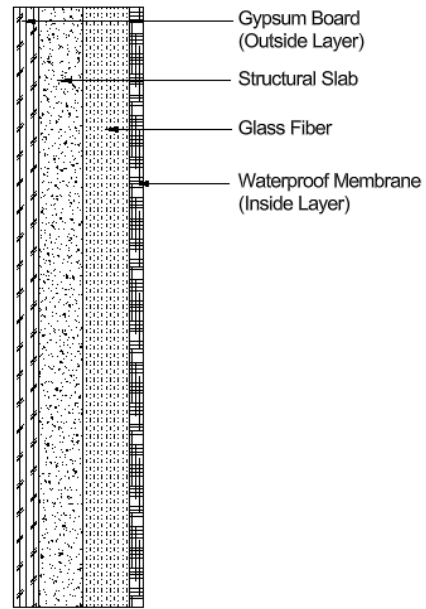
The Construction Design for the Montpetit Hall Underground Wall
